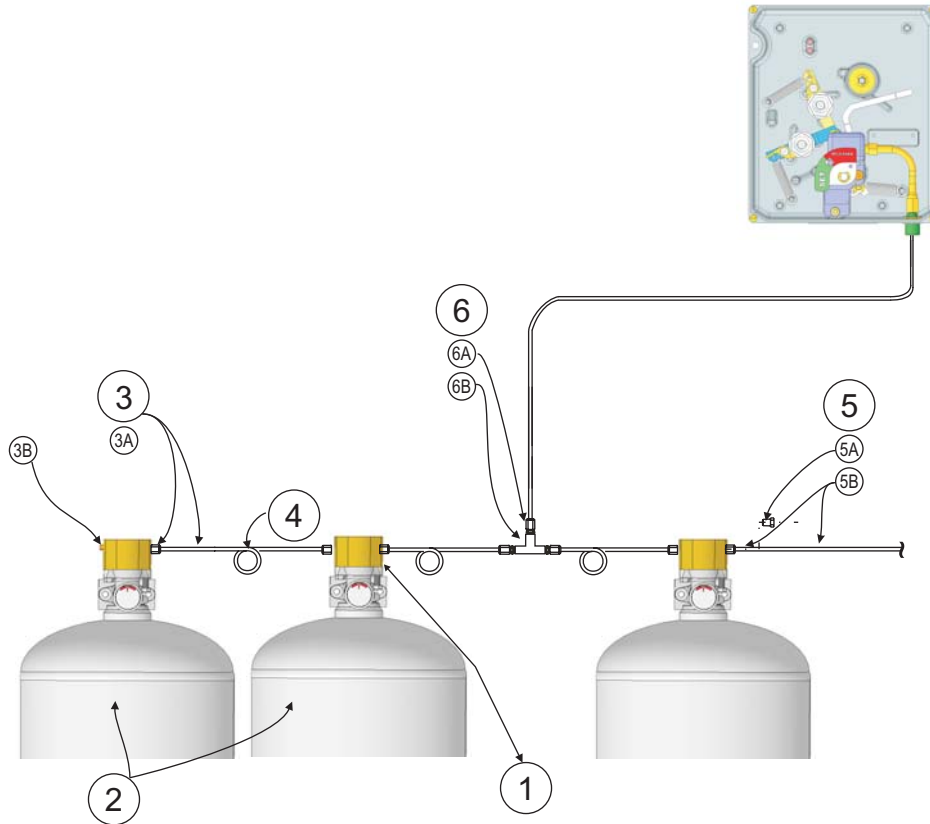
Tee In-Line Entrance to Actuation Manifold
